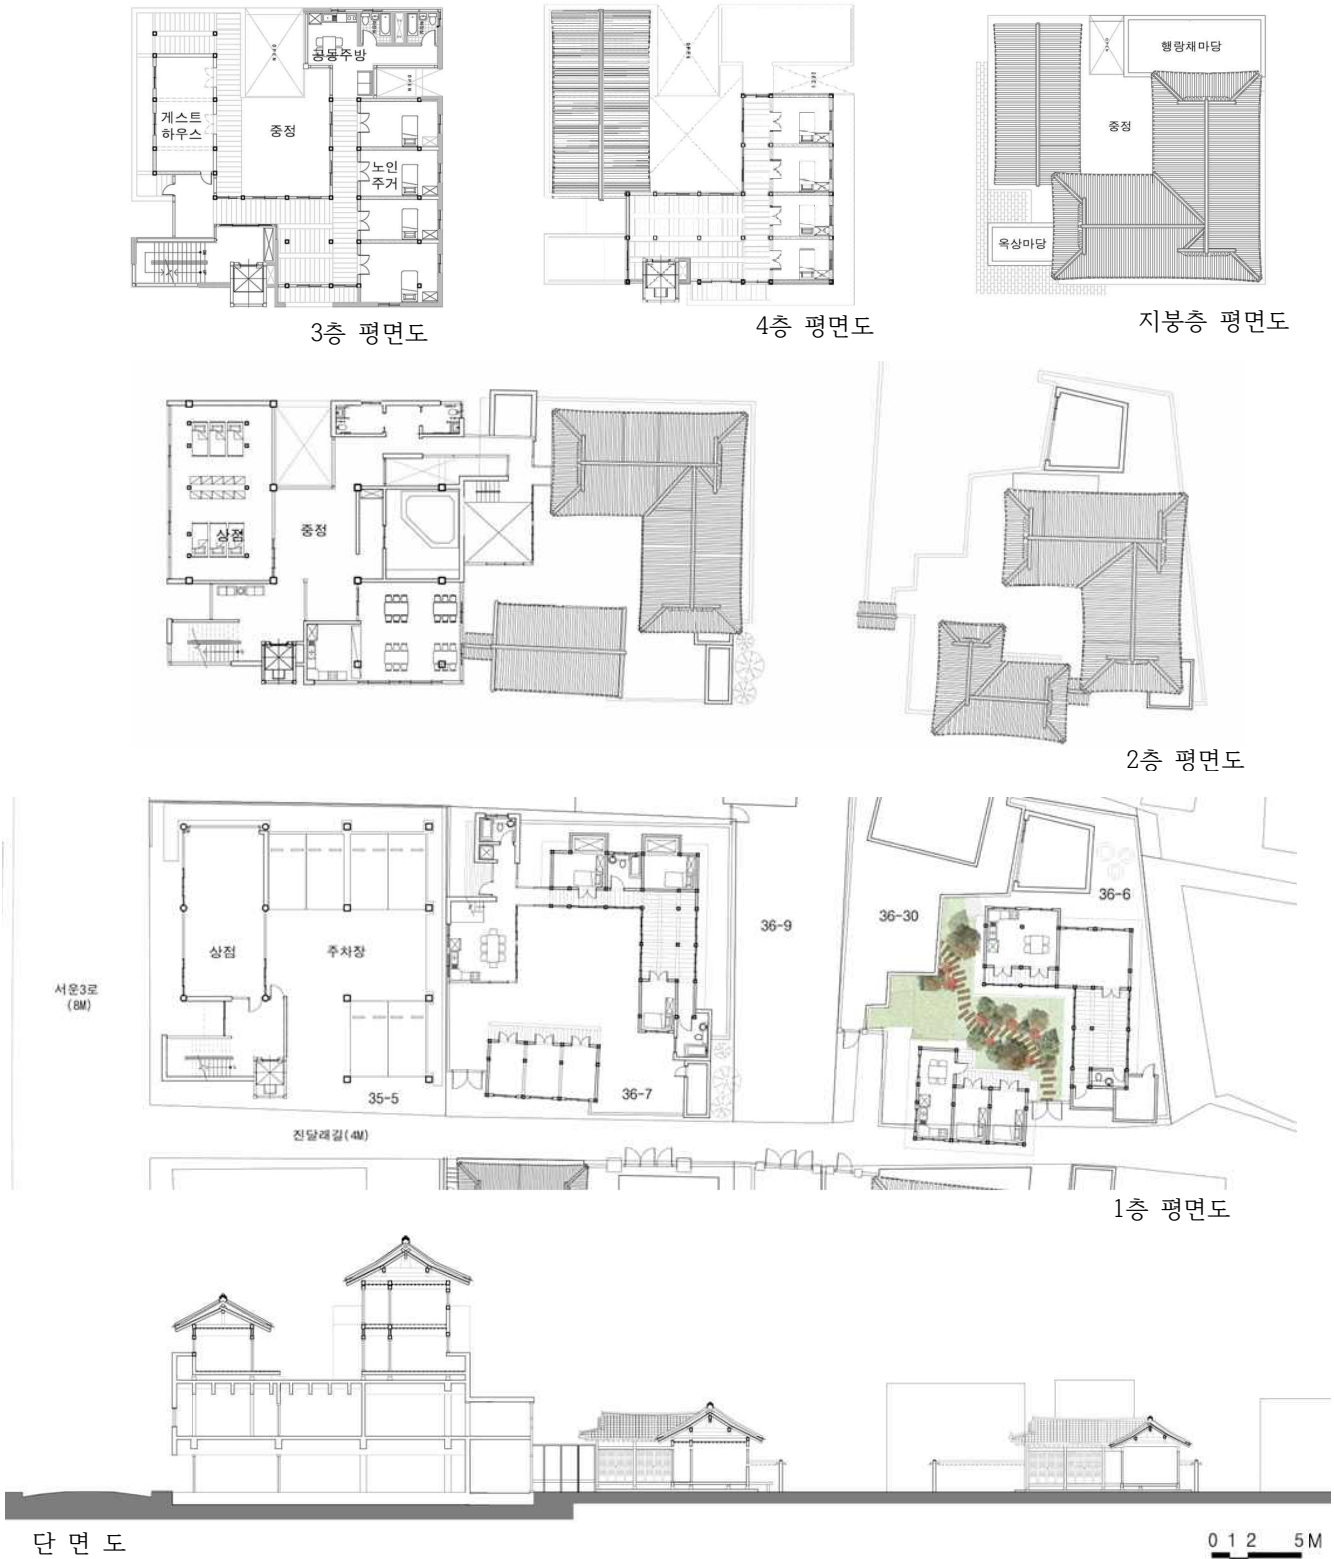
Plans and sections of 35-5, 36-6, and 36-7 Han-ok houses in Seoun-dong
